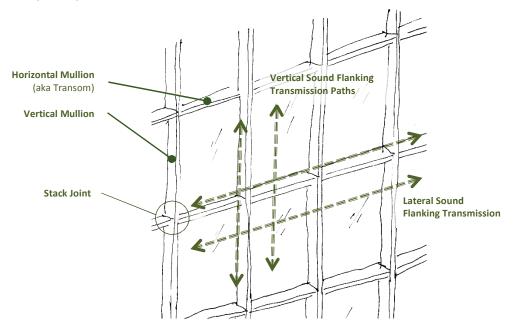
SOUND TRANSMISSION PATHS ALONG A CURTAIN WALL FACADE
